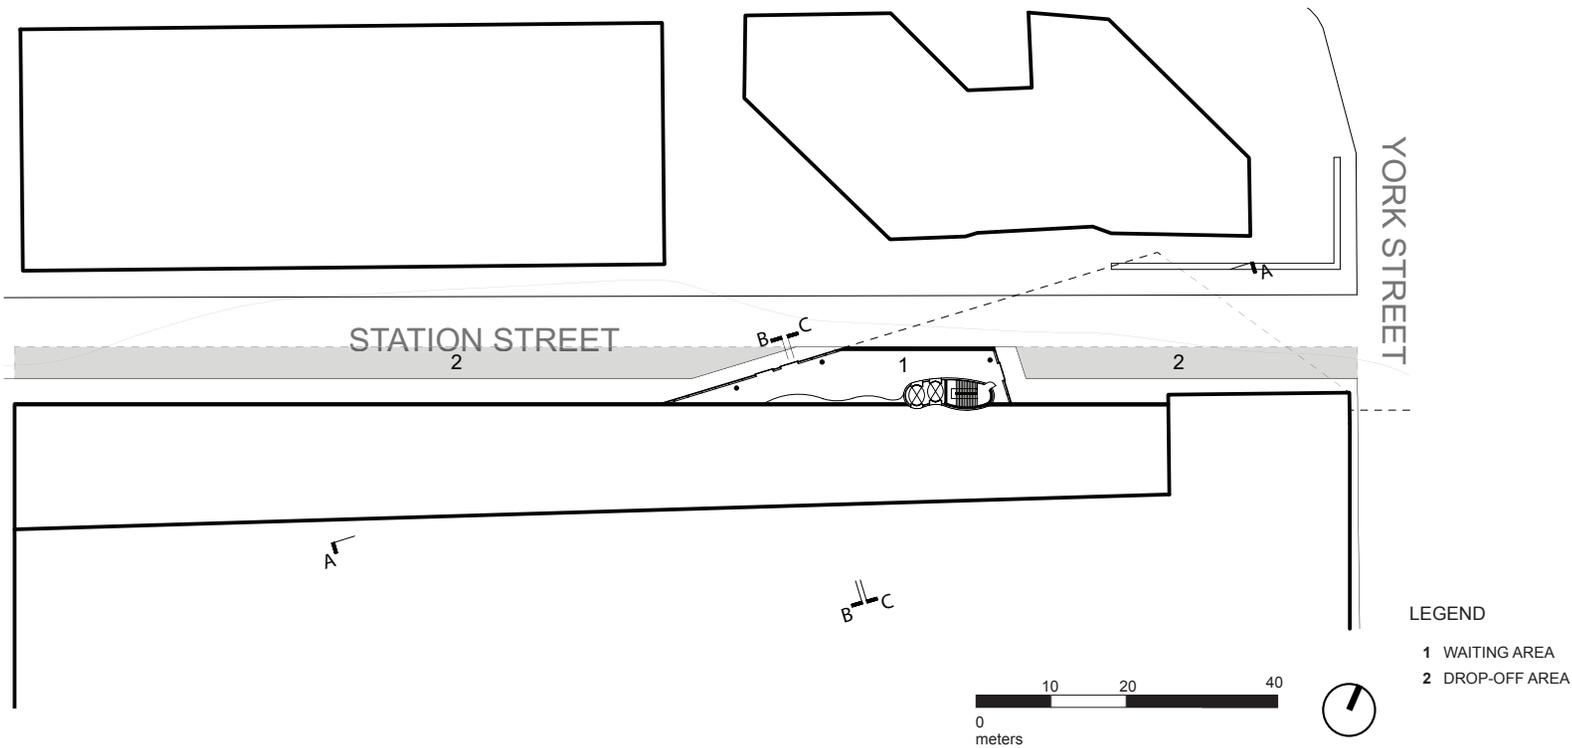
Ground level floor plan - Station Street pick-up and drop-off area and vestibule.
